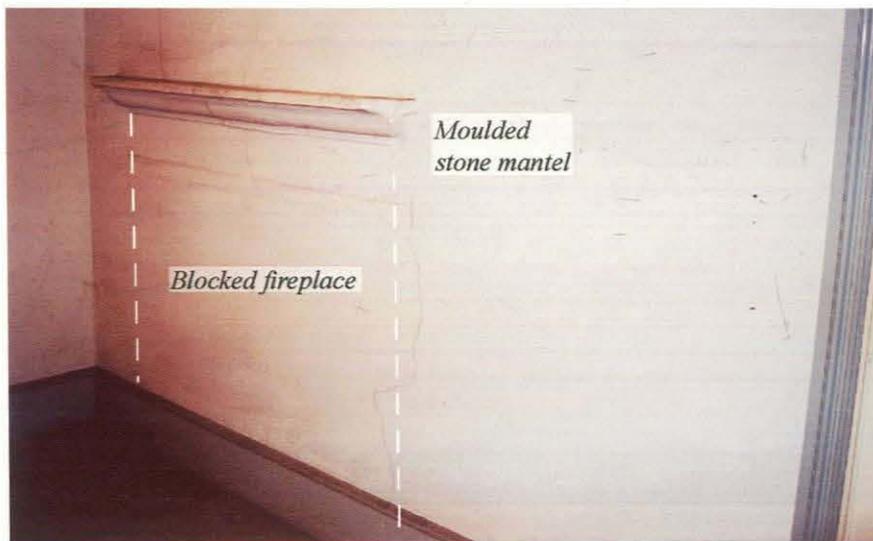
Room 65/17, no.65, first floor, west wall, featuring a blocked-in fireplace.
